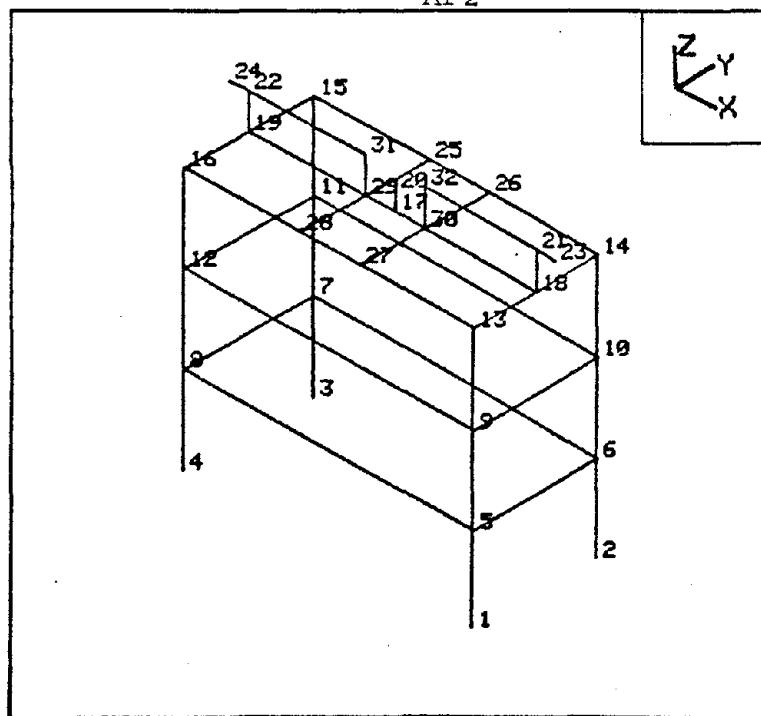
DIMENSIONS OF TEST FRAME
